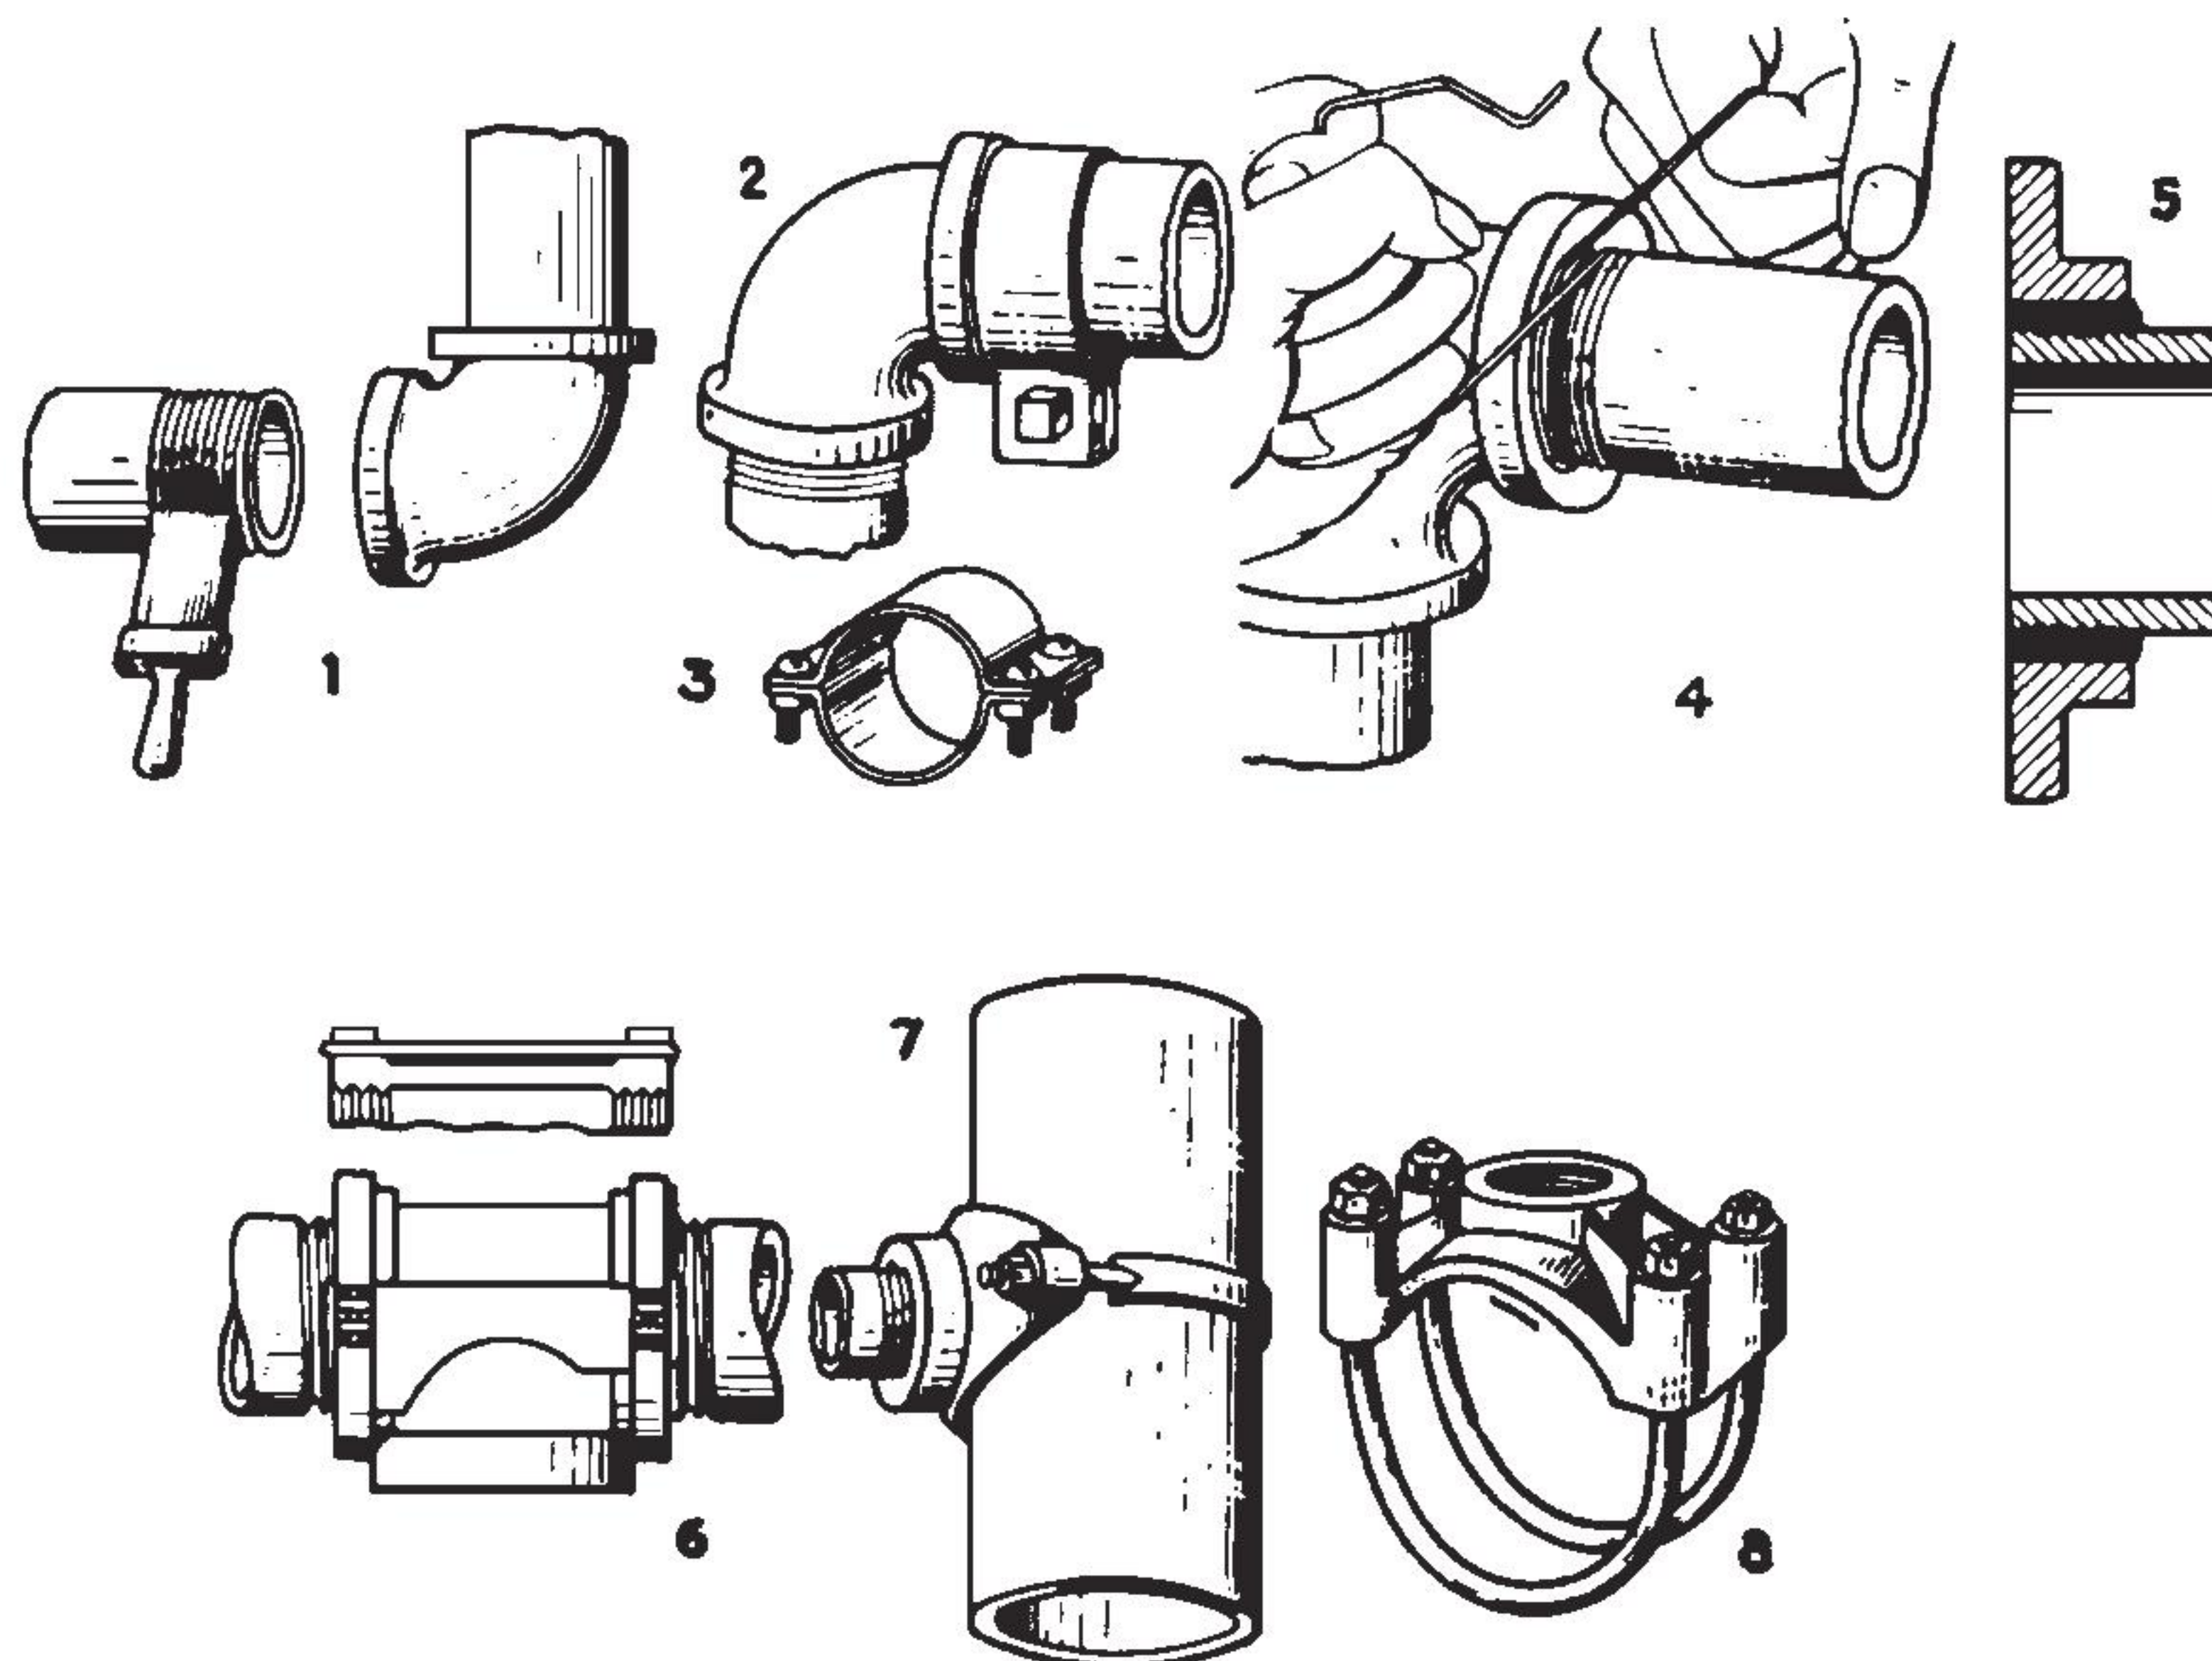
Repairs for threaded joints. Iron cements specially compounded for the service may be applied as paste or putty to seal pipe joints and cracks. Cement used thin makes a good new-thread dope (1). For best results, leading joints should be remade with cement; otherwise cement can be caulked under pipe clamp (3) alongside leaky thread (2). Another thread-leak repair involves winding soft wire (4) around cement putty at leak. Allow cement to harden before using. In emergency, a threaded pipe may be cemented into a flange of larger pipe size (5). Tamp cement solidly in place. Crack in fitting (6) sealed with cement backed by metal plate. Outlet saddles for water (7) and steam (8) are clamped to pipe over drilled holes to make emergency branch connections. Saddles may be packed with soft gaskets or cement.
